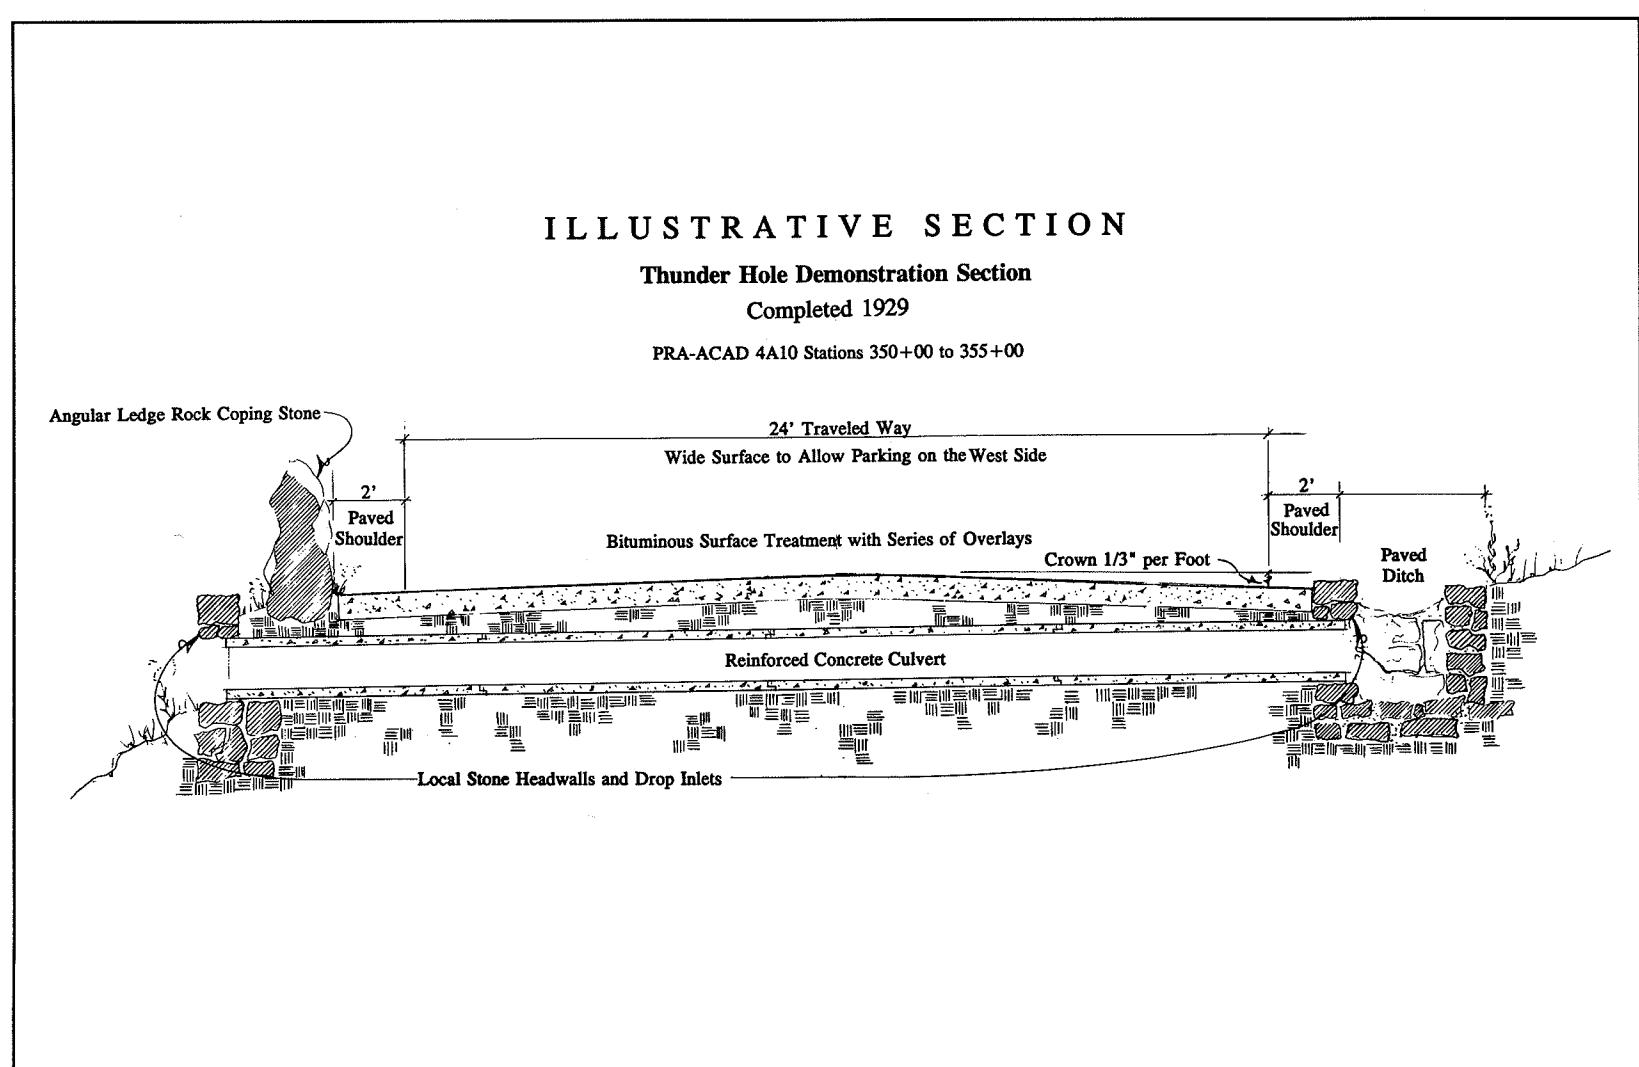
Illustrative cross-section, Ocean Drive Demonstration Section. Drawing by OCLP.
